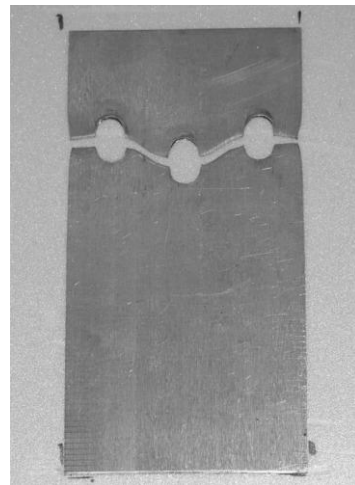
Photograph of Test Specimen in Tensile Test Machine
